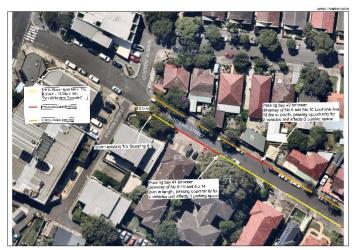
Proposed concept plan of passing bays in Schwebel Street
